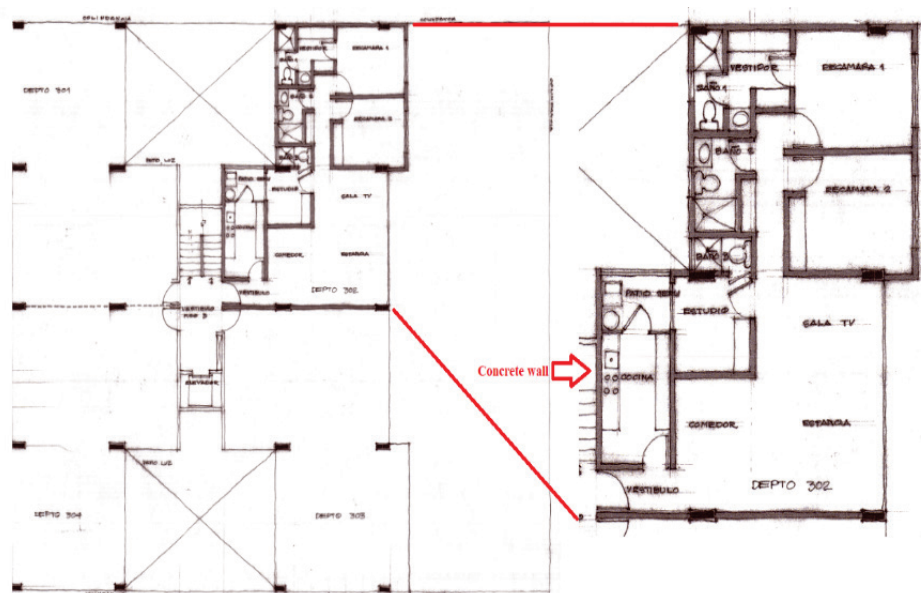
Masonry wall and infill wall locations for an apartment unit of a typical floor.
